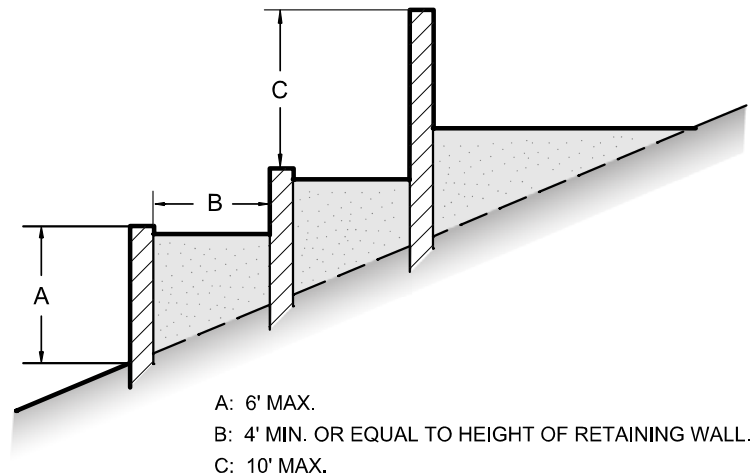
RETAINING WALL DIMENSIONS
